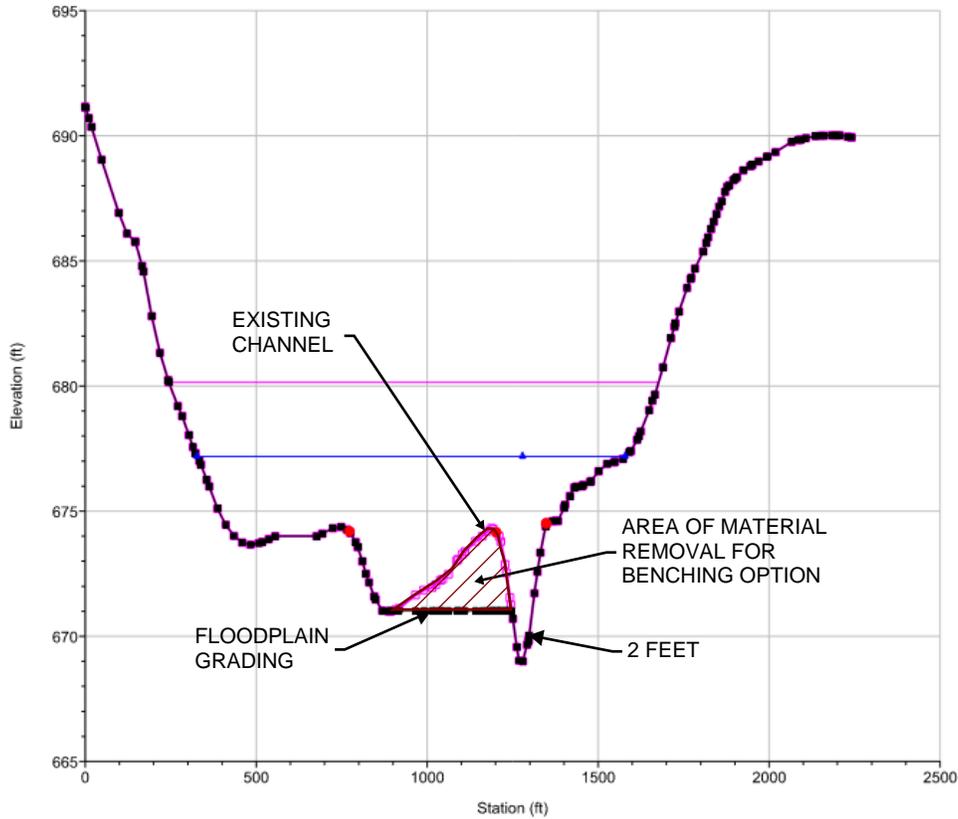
Typical Channel Grading Section from East Renfro Street to East Hidden Creek Parkway.
